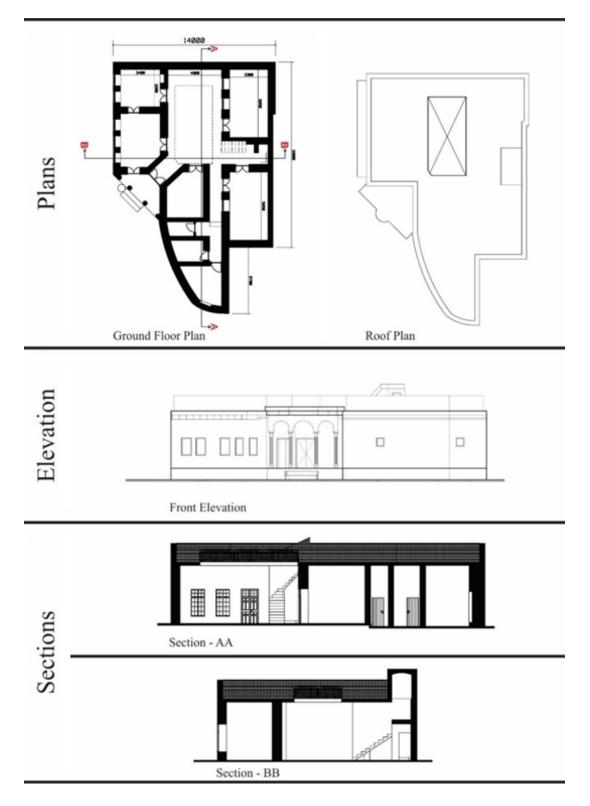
Plans, elevation and sections of house 01. (Abbas, 2015)
